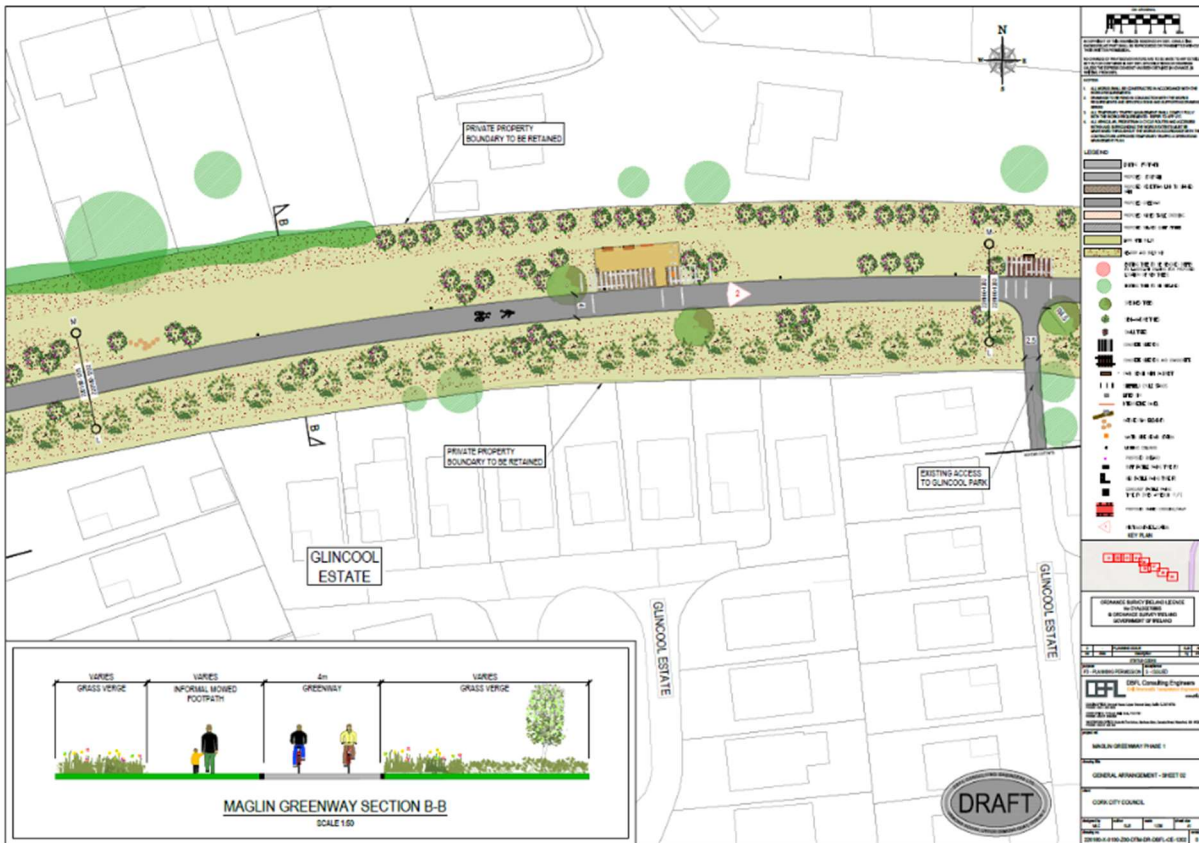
Proposed Route Detail 2 – Alignment between Glincool residential area to south and residential area facing Sunningdale to the north
